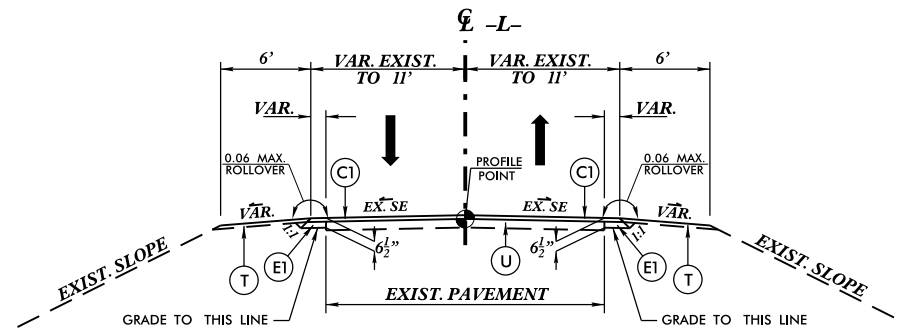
DETAIL SHOWING SHOULDER BERM GUTTER (SBG)
